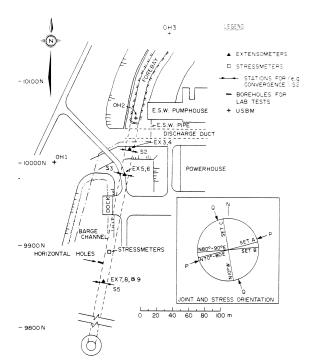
Plan View of the Darlington G.S. (Lo and Lukajic, 1984)
